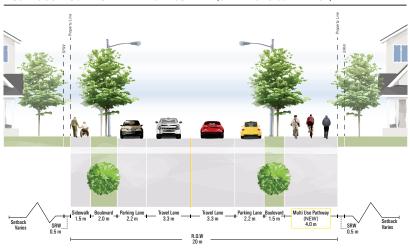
C 61A AVENUE FLEX ROAD (136 STREETTO KING GEORGE BOULEVARD)
